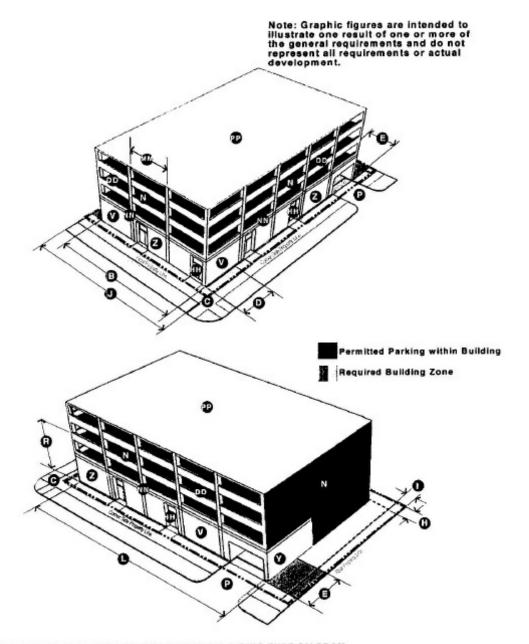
Y: STRUCTURED PARKING BUILDING TYPE DIAGRAM.
